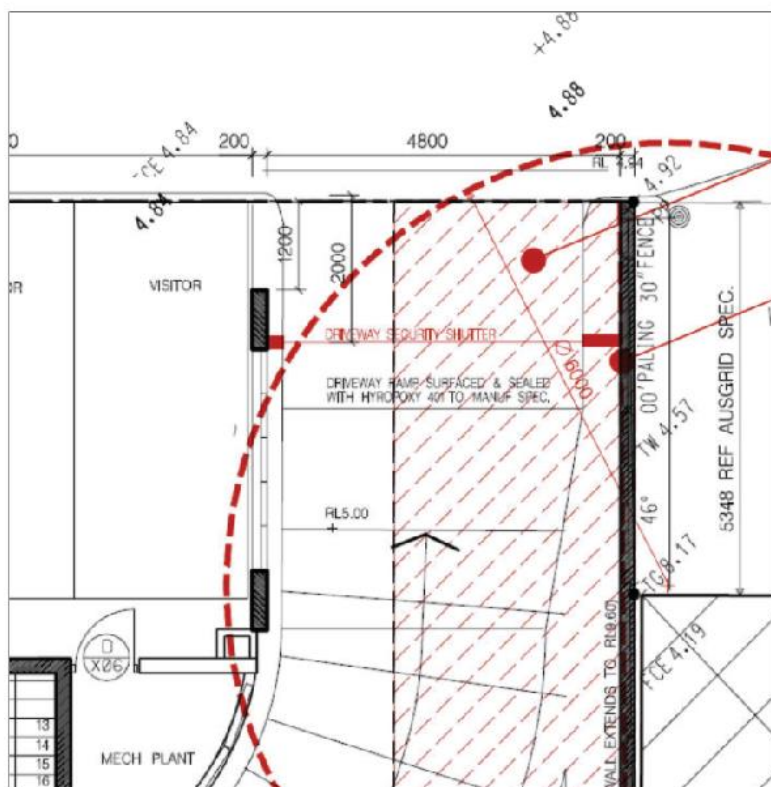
Relocated roller shutter and roof over driveway (Source: Arc Architects Level 1 Site Plan)
